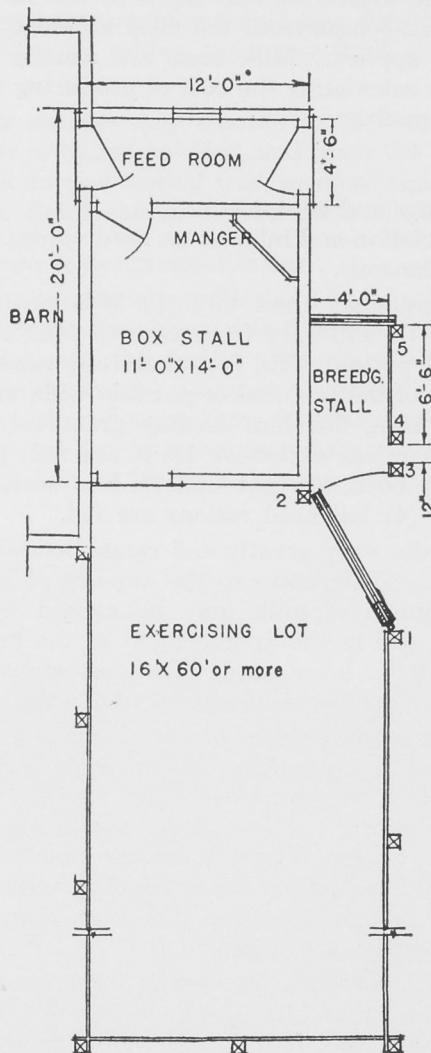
Floor plan of a bull shed, exercising yard, and breeding stall.
